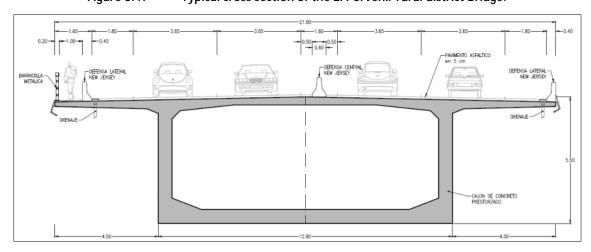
Typical cross section of the El Porvenir rural district Bridge.
